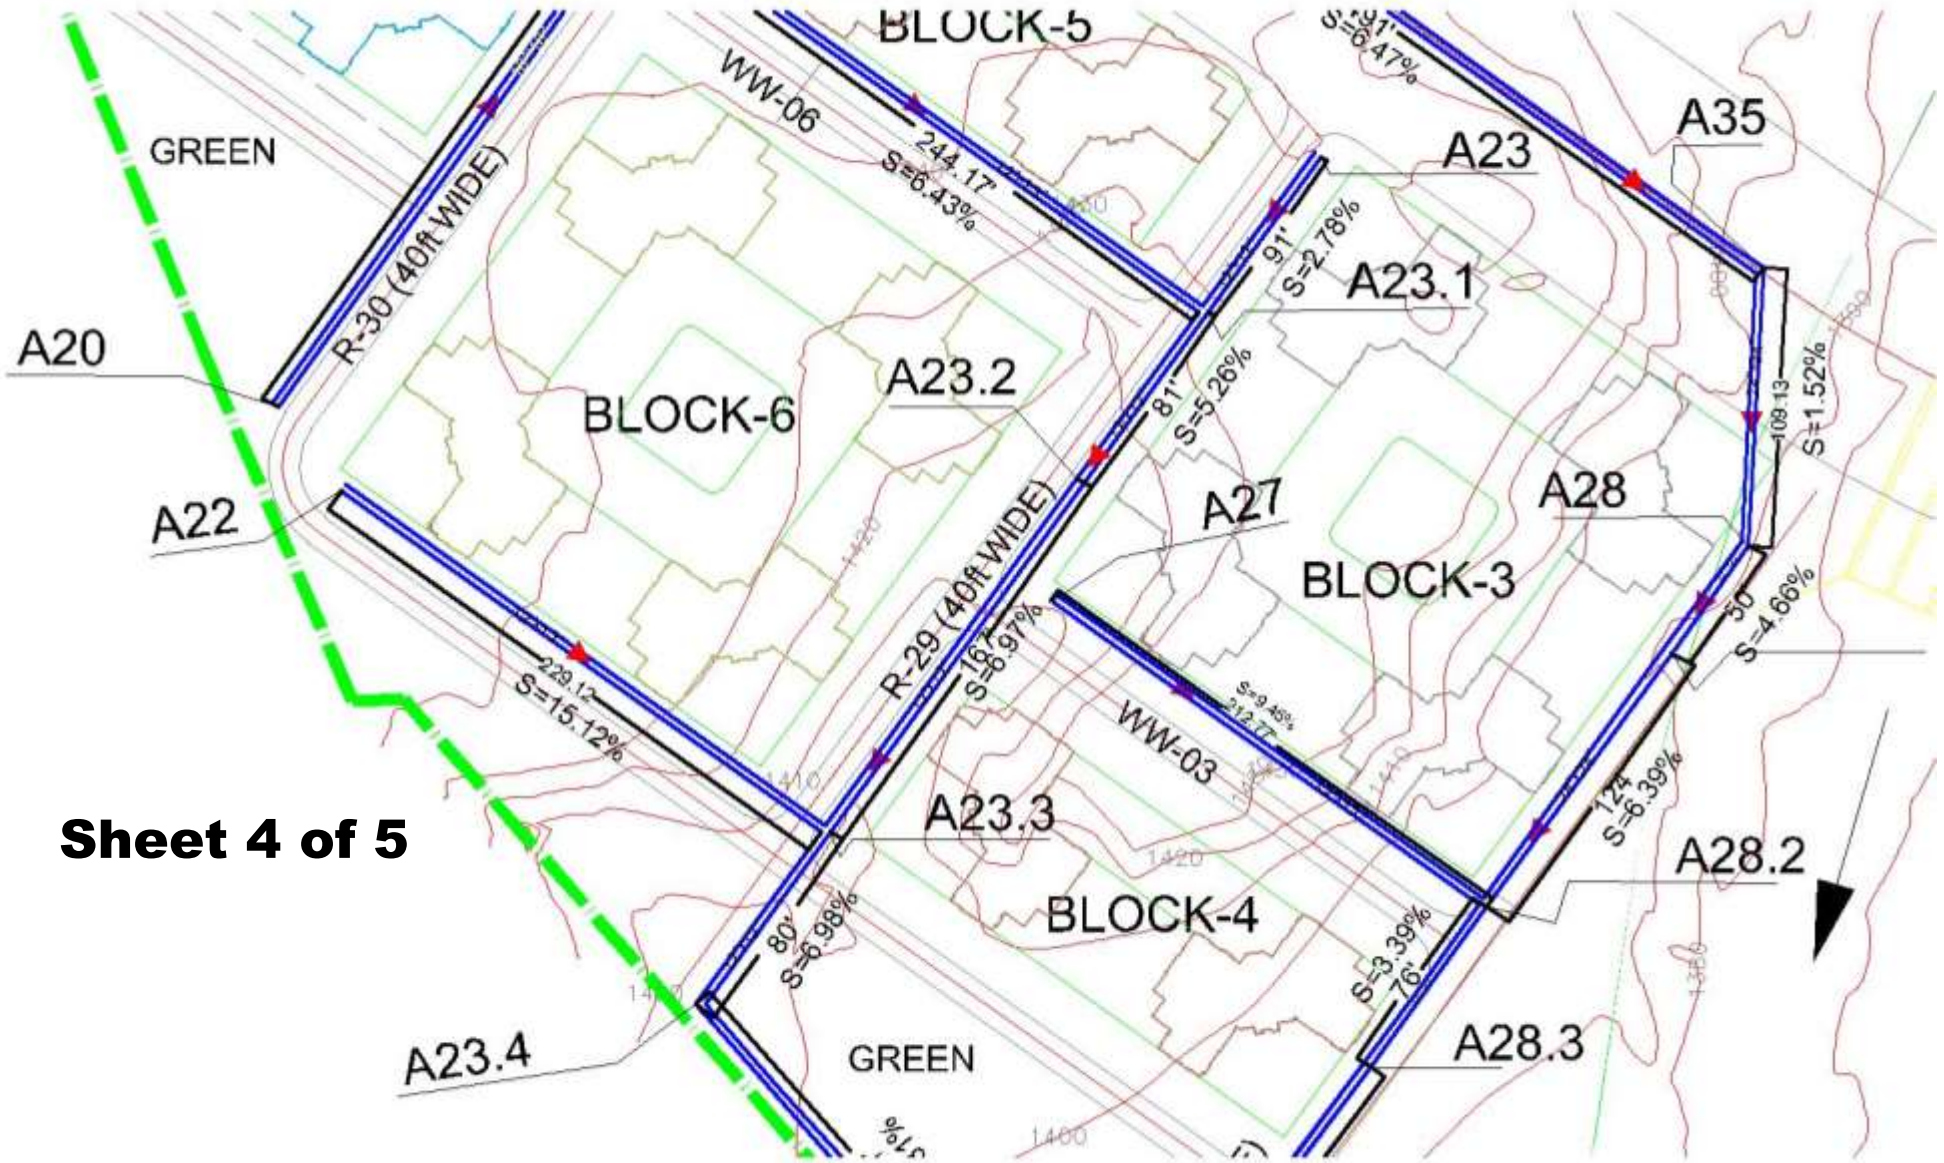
Storm drainage layout plan of Sub-catchment-9 part two at R/S of MR-01
